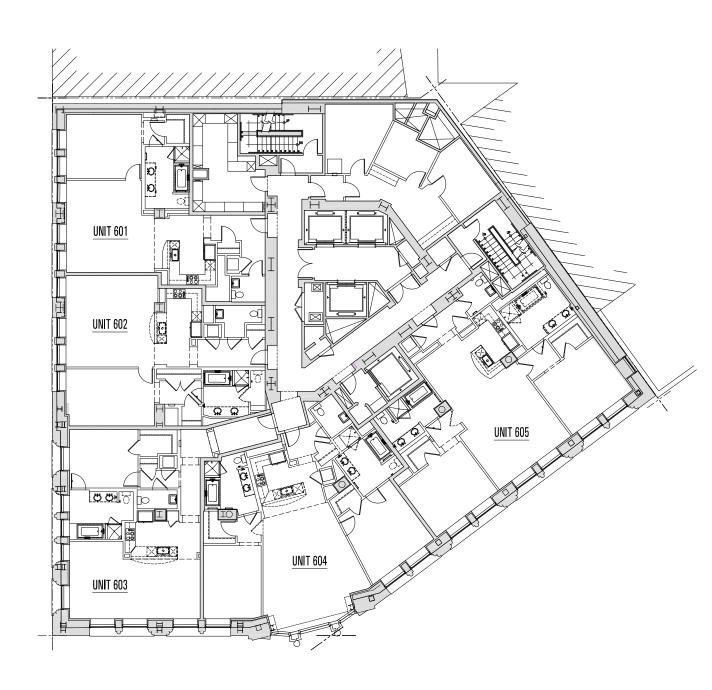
PROPOSED SEVENTH FLOOR PLAN
